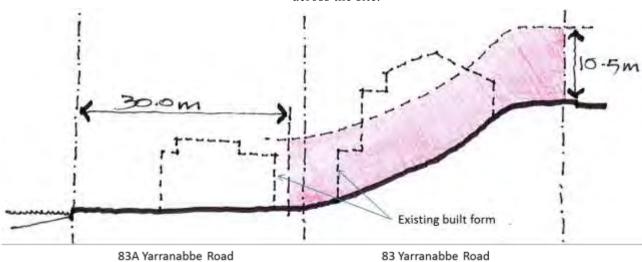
Existing Woollahra LEP 2014 building envelope for multi dwelling housing or RFB development
